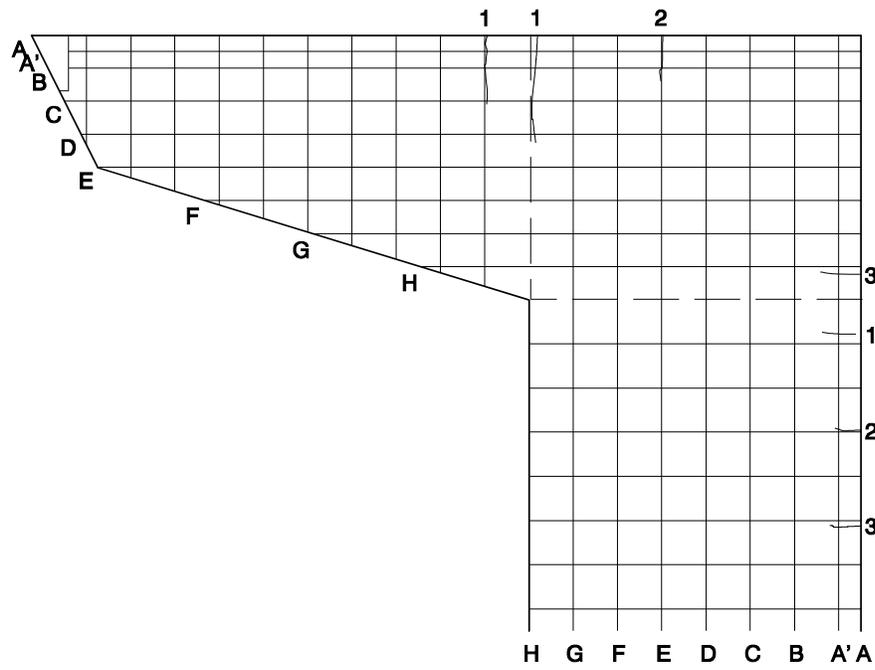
Cracking patterns on south face of Specimen POJ-PU-74-TH at dead load
